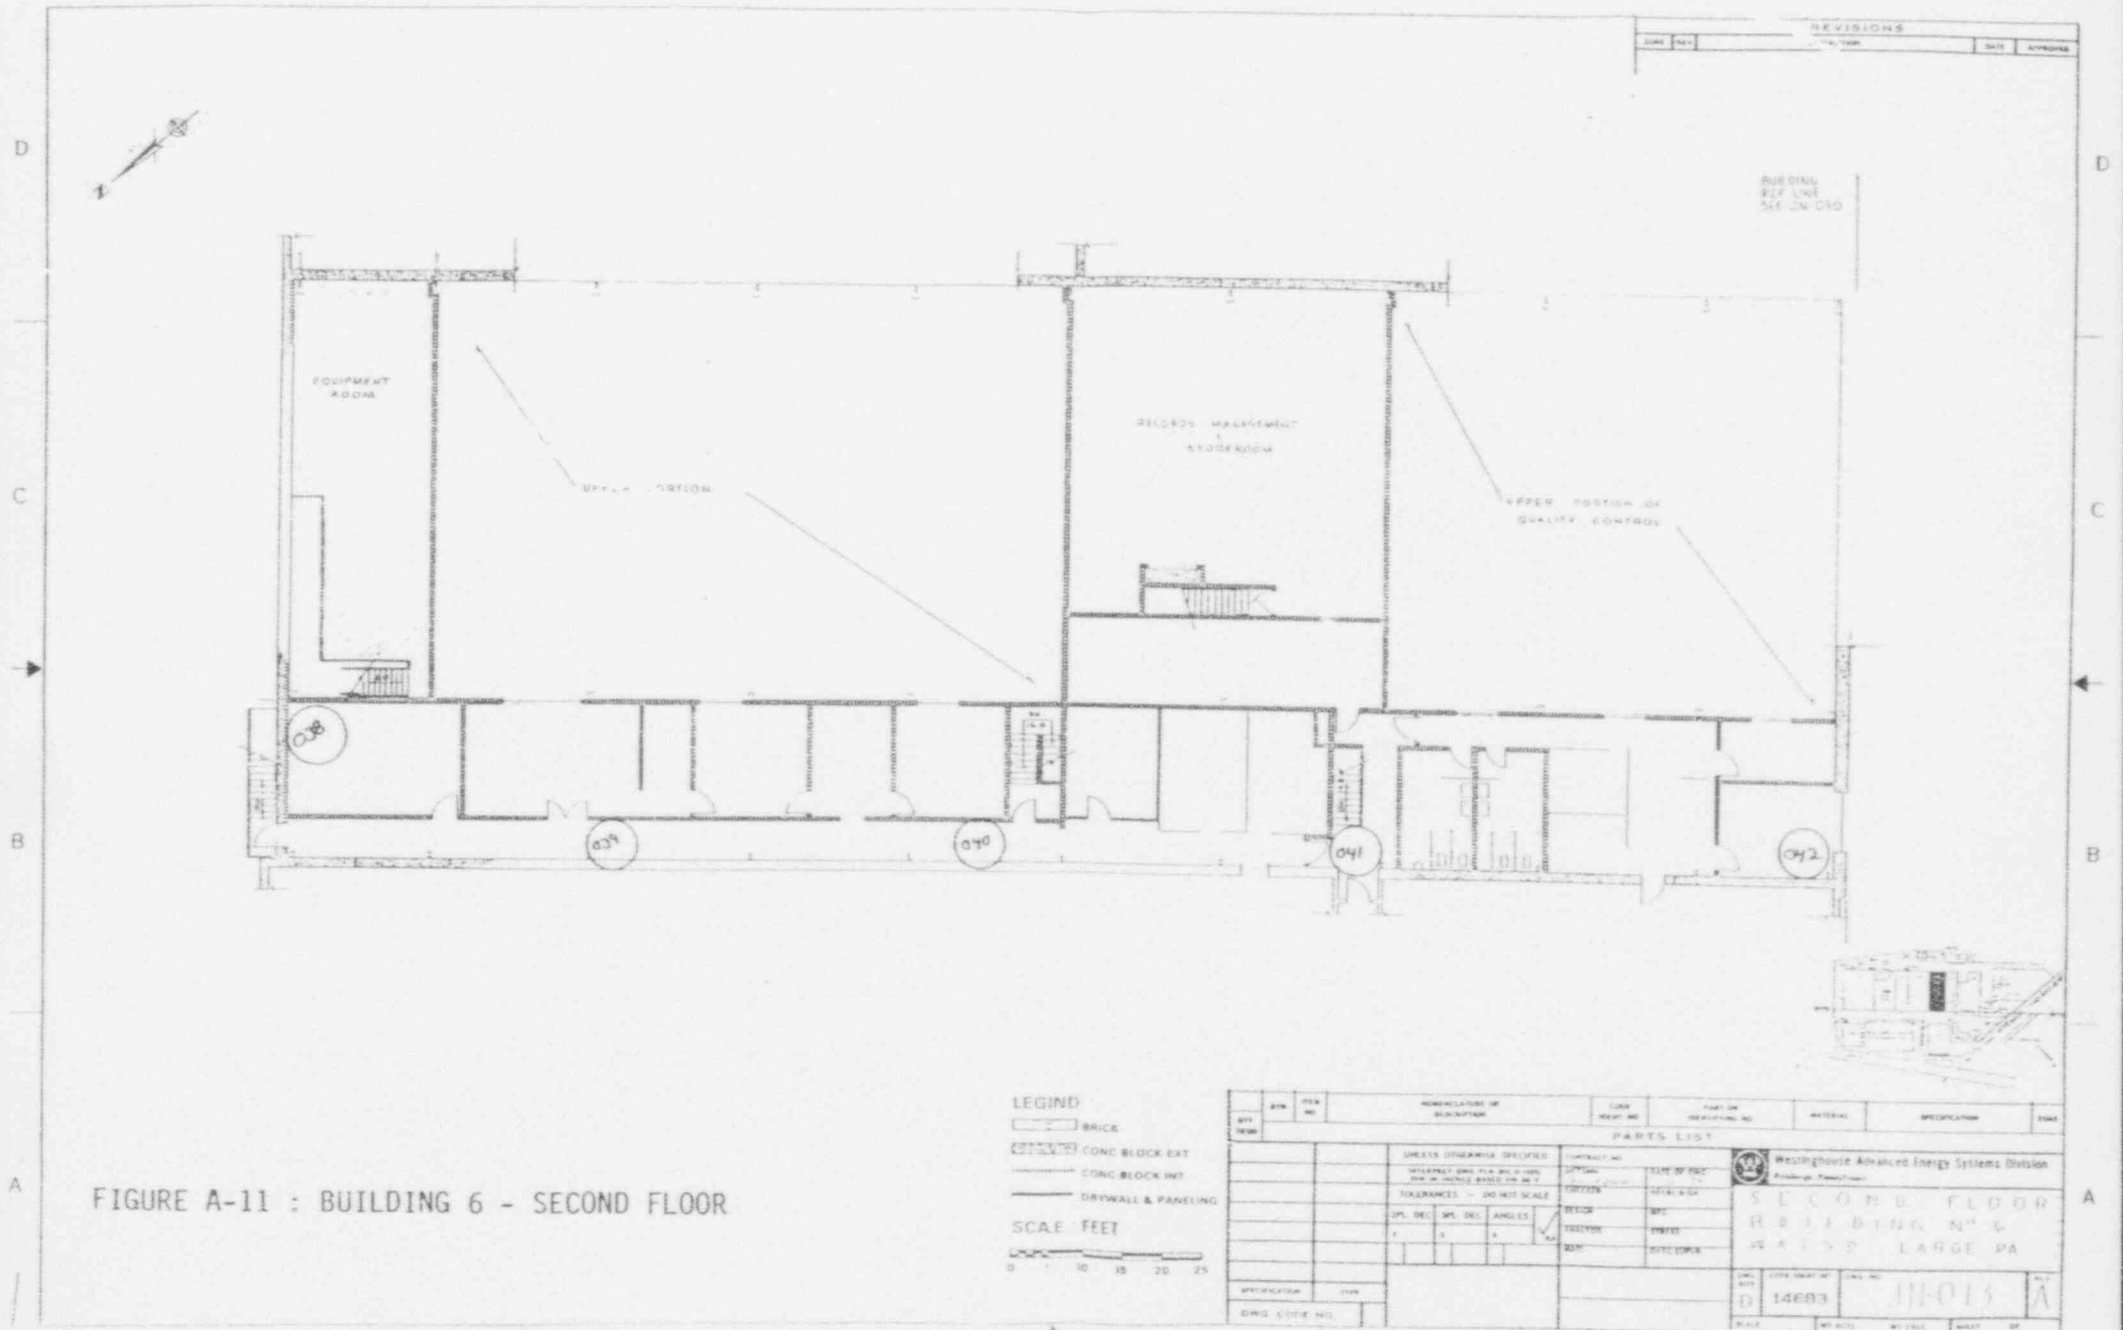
BUILDING 6 - SECOND FLOOR
